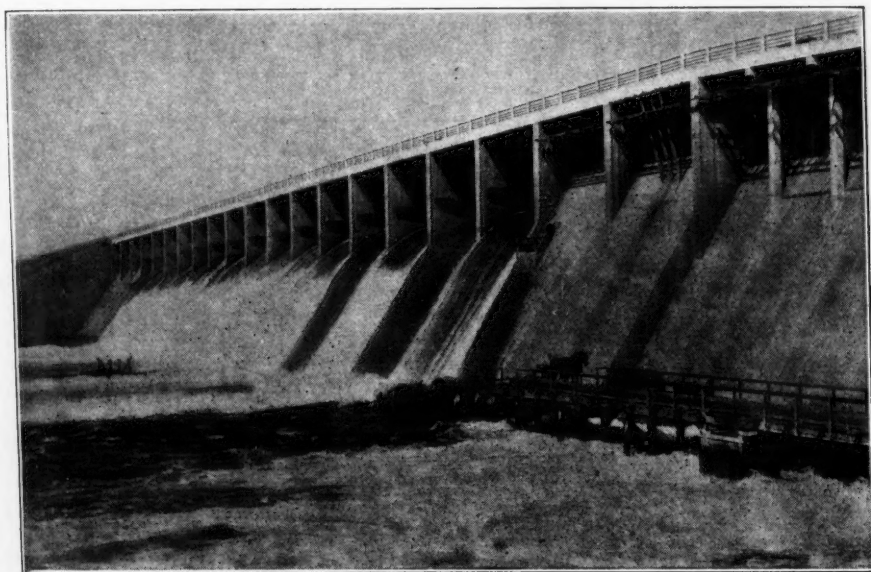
GENERAL VIEW OF SPILLWAY SECTION, AMERICAN FALLS DAM, MINIDOKA PROJECT, IDAHO.
